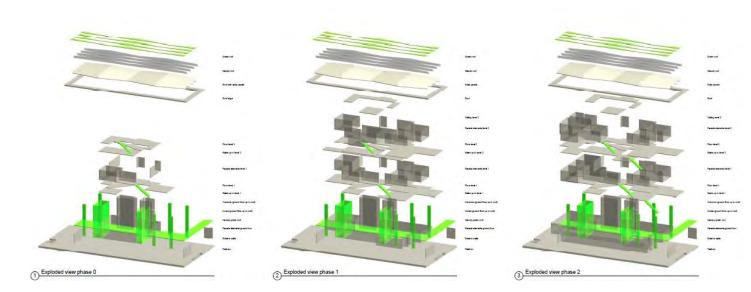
Schematic overview of the Green Transformable Building Lab structure.
